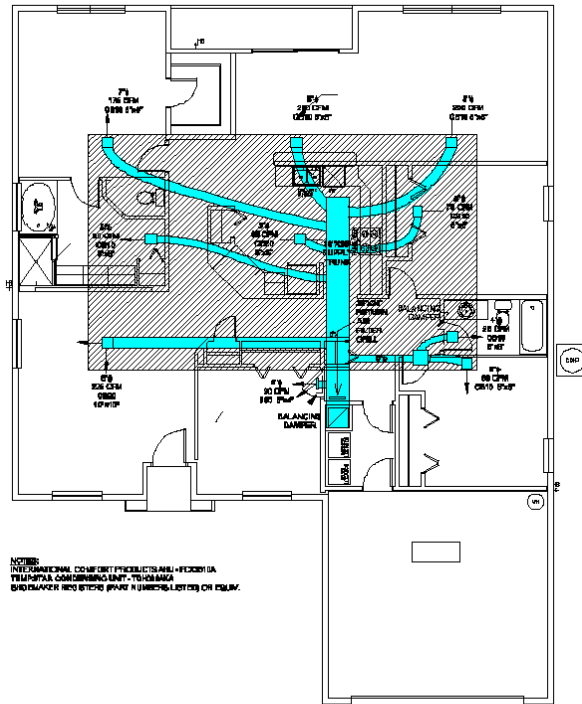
Plenum Truss Duct System layout (Lora Isle Model)
